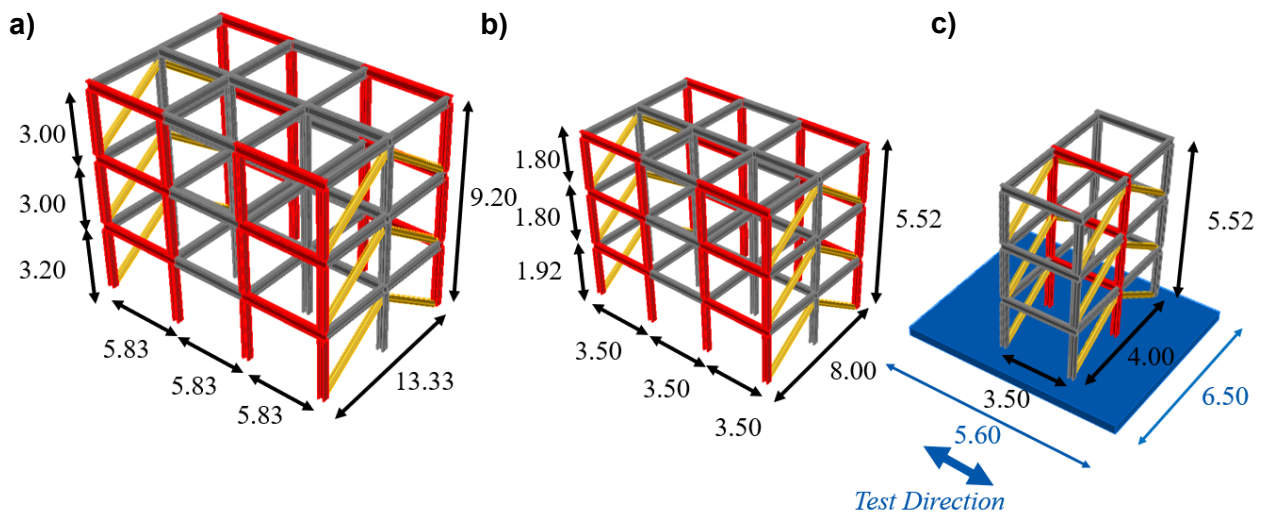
3D view & geometries of: a) Prototype; b) Scaled Structure. c) Test Specimen. [Dimension in m].
